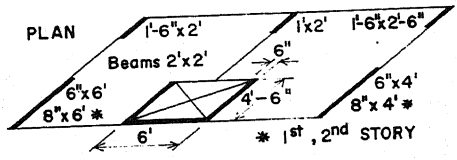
SPACE FRAME OF A 5 STORY REINFORCED CONCRETE BUILDING - NO. 5
